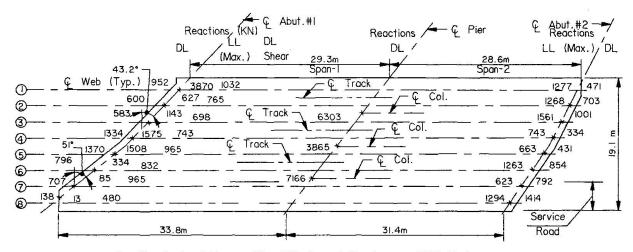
Sectional Framing Plan With Support Reactions - SPRR Bridge
